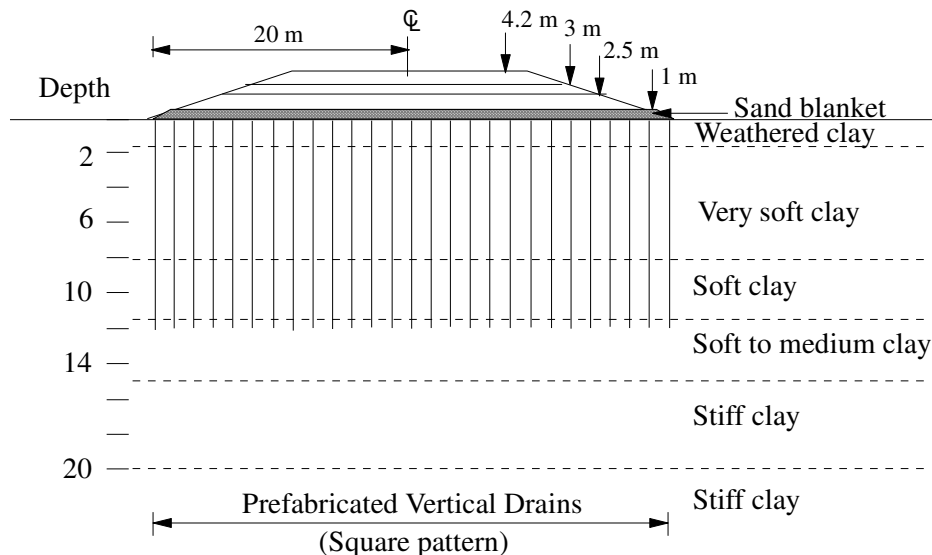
Cross section at embankment with sub-soil profile, Second Bangkok International Airport, Thailand (Redana, 1999)
